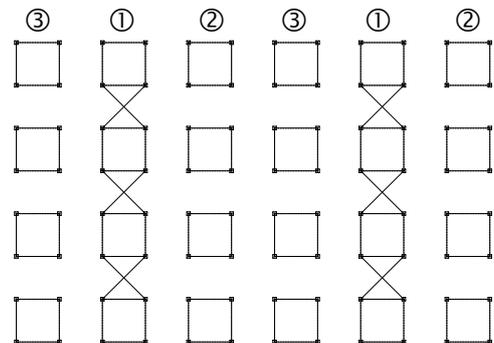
Diagonal cross-braces for towers that are 6,00 to 9,00 m high
